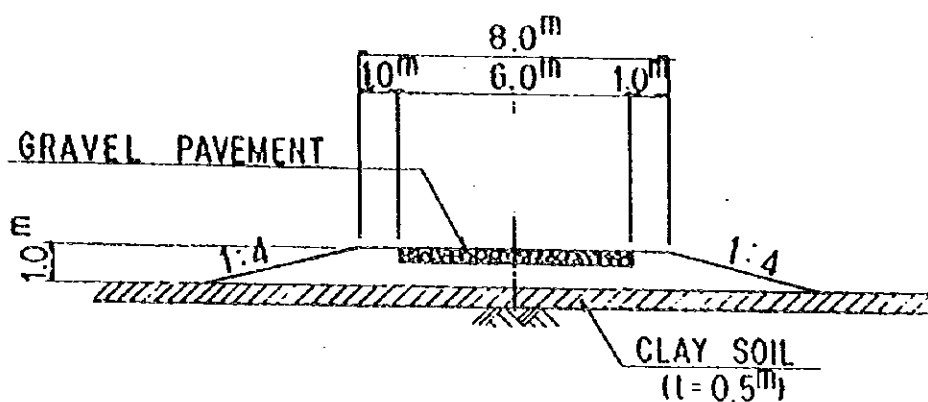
Sectional Elevation of Lahmidate Disposal Site (Zone I)
